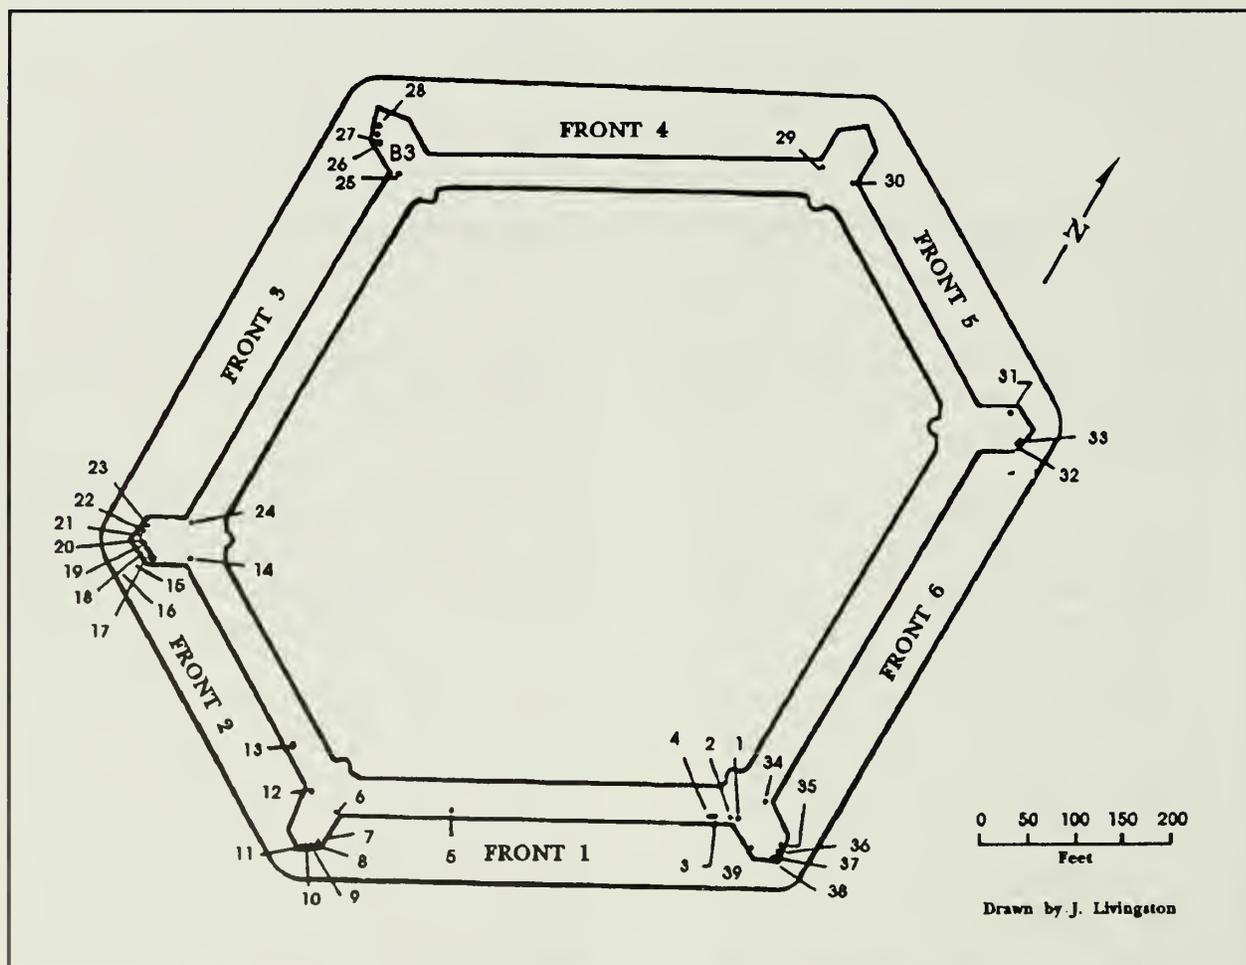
Area covered by 1971 wall crack survey.
